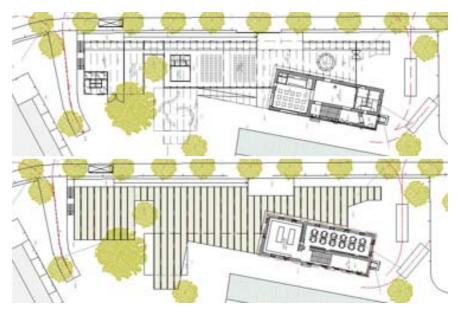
The E-Learning Café in the Botanical Garden: main floor and first floor plans
